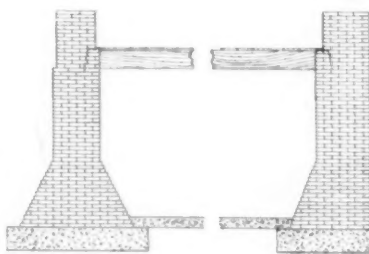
The two types of spread footings—a development of the dwelling house foundation—suitable for buildings up to seven or eight stories.
